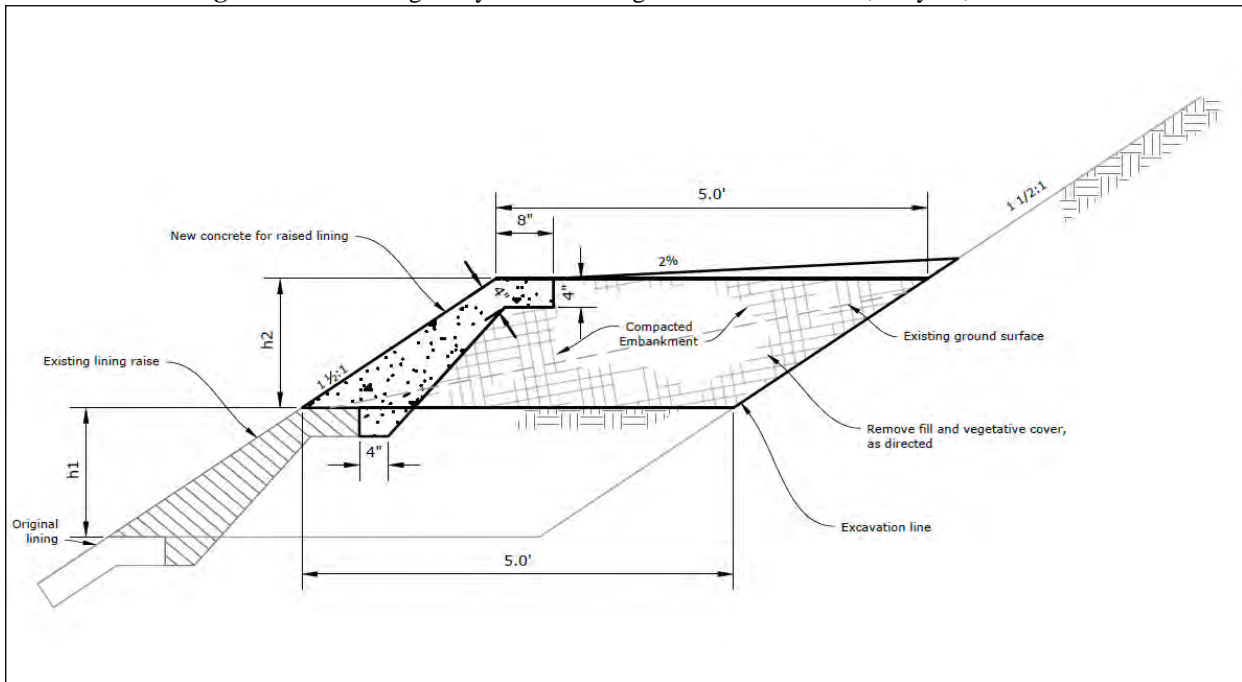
DMC typical cross section showing placement of original concrete lining, previous lining raise, and proposed lining raise.
